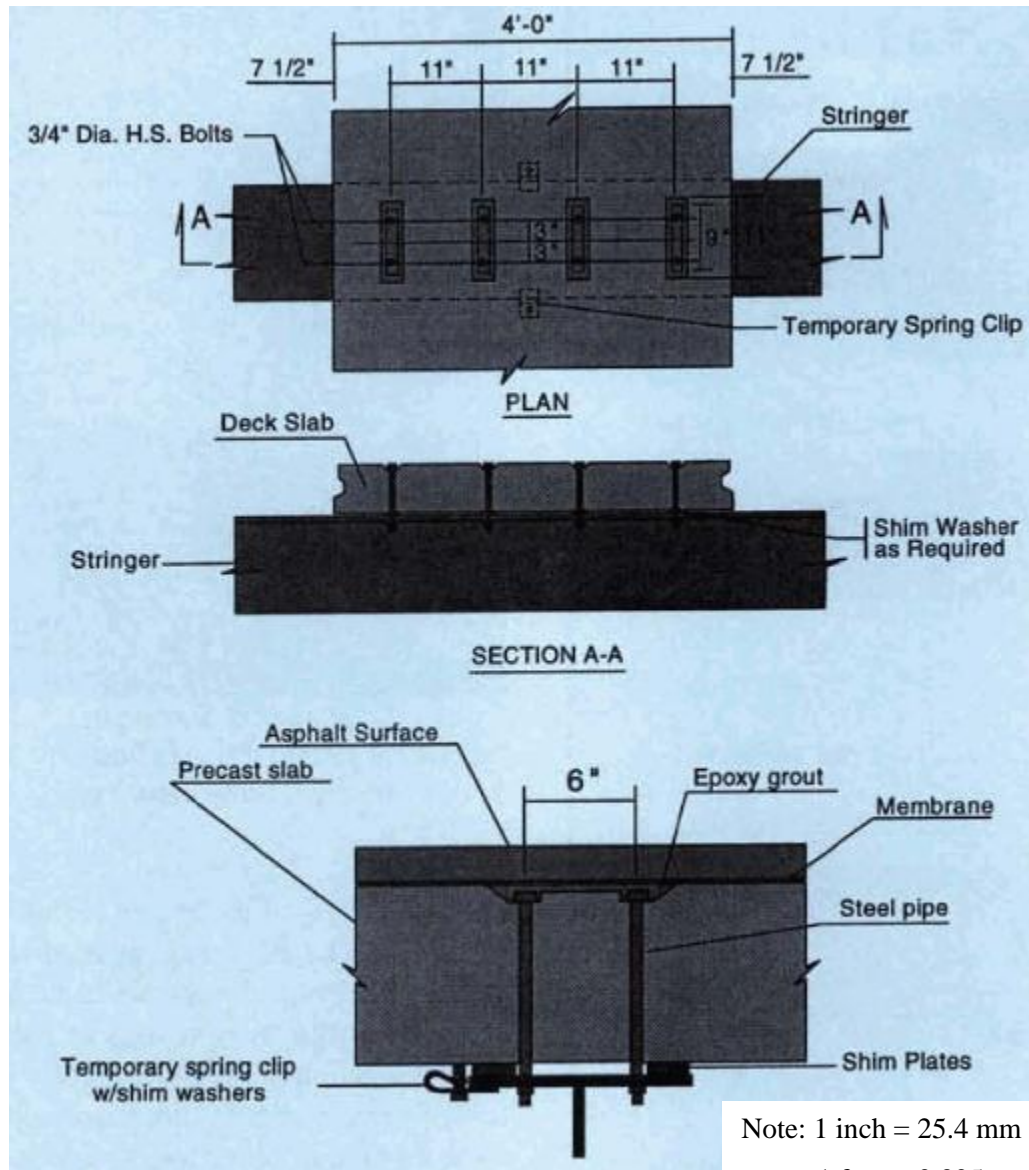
Bolt Connections Details for the Amsterdam Interchange Bridge [Issa et al., 1995]
